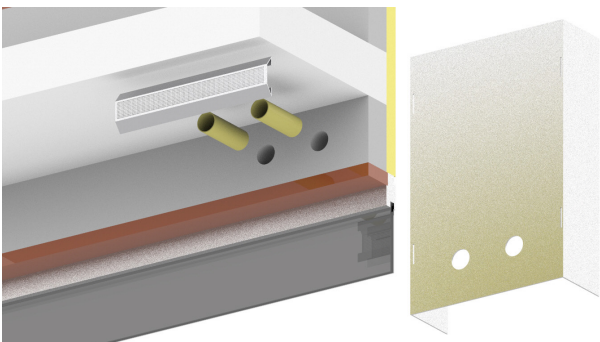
| Render of an exploded view with the ventilation grille, the ventilation tubes and the outside box | Source: own work
